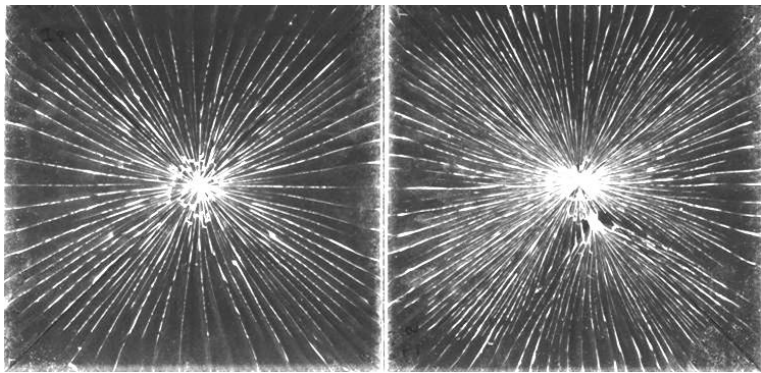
Fracture patterns for specimens with only bottom plate fracture; specimen I2_3 (left) and I2_1 (right).
